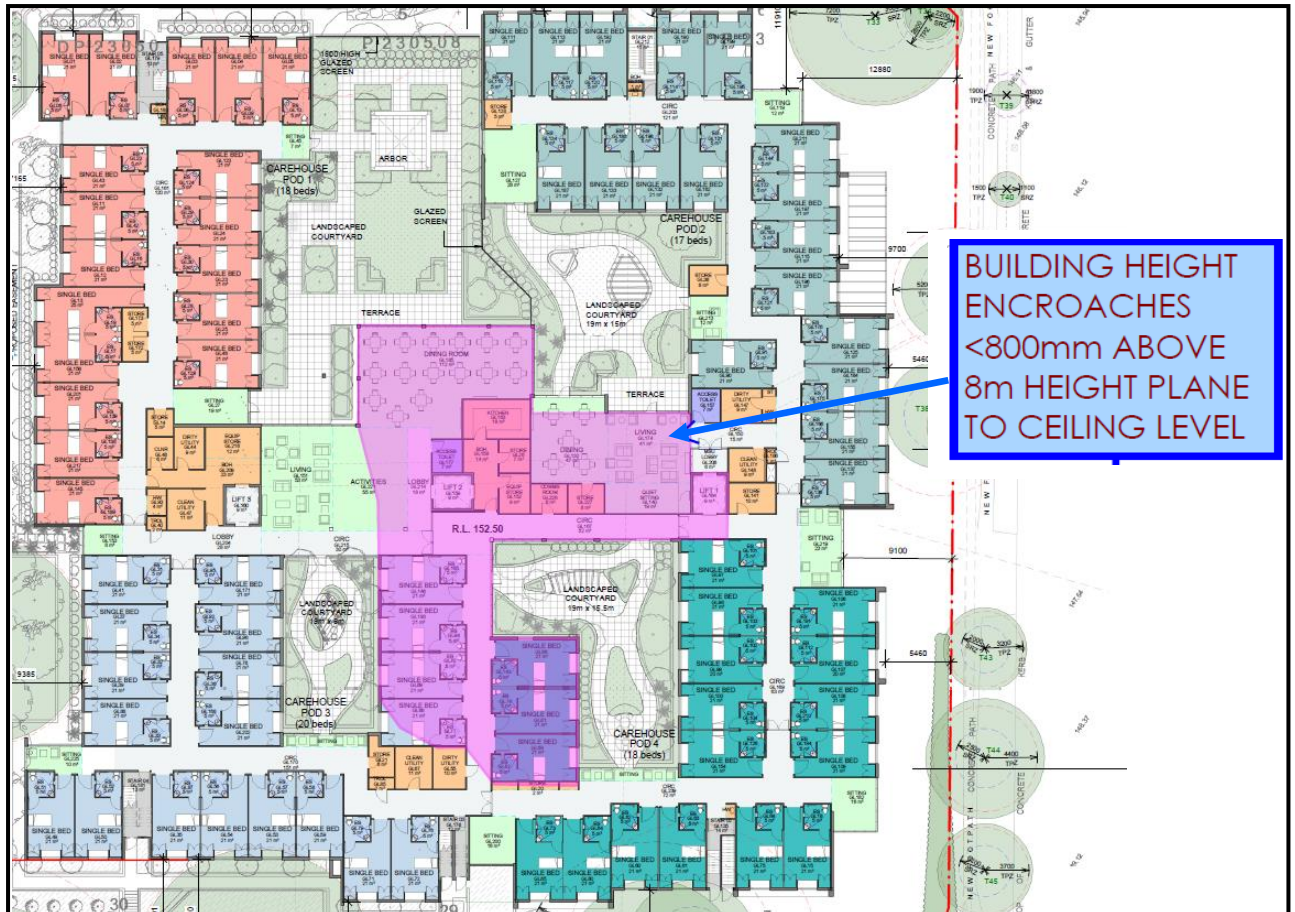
Ground floor plan – with area over 8m in height highlighted
